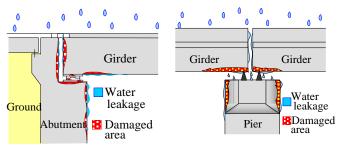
Schematic view of typical damaged RC girder ends with pier and abutment due to salt attack.
